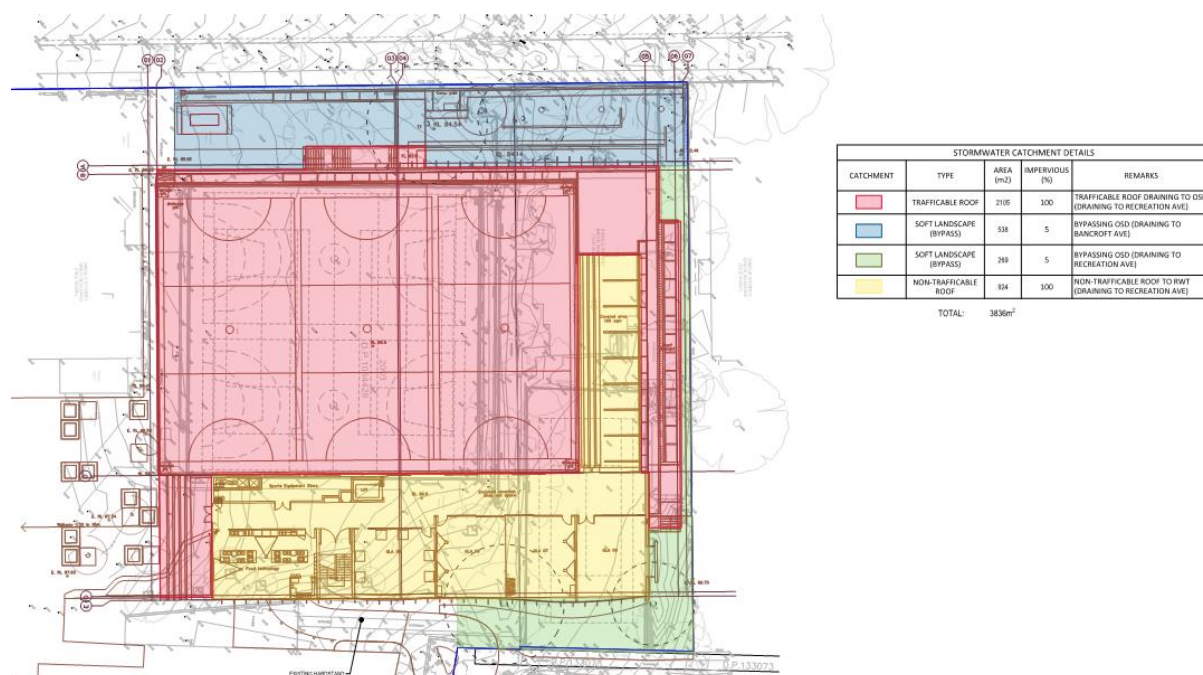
Drainage Catchment Plan Summary for SWELL Centre Development
